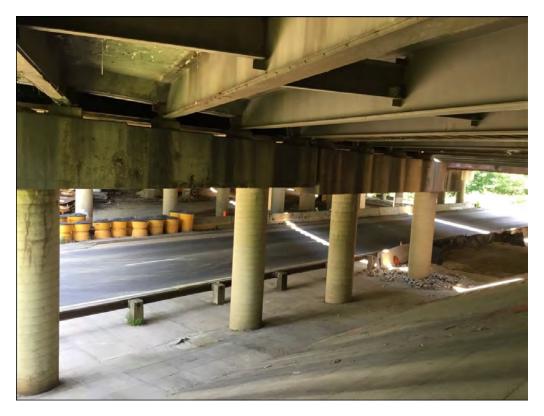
Suitland Parkway Outer Loop (160015) - Looking southwest at piers. Gaps between pier caps may provide roosting locations for bats.
